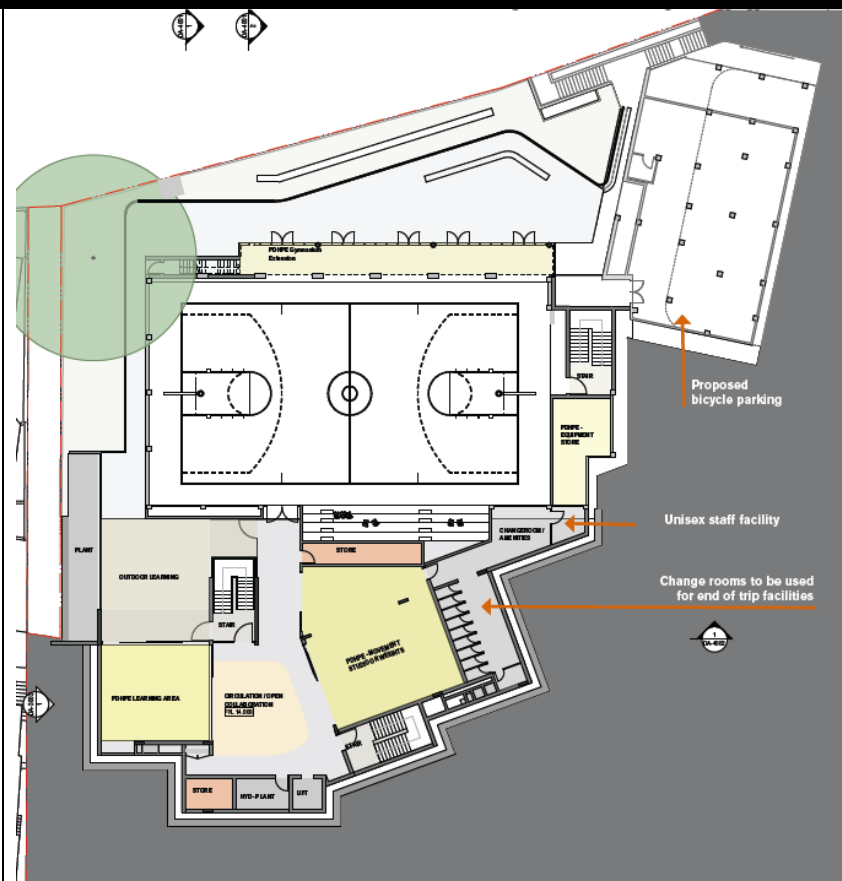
Plan of Lower Ground Level 4 showing proposed end of trip facilities
